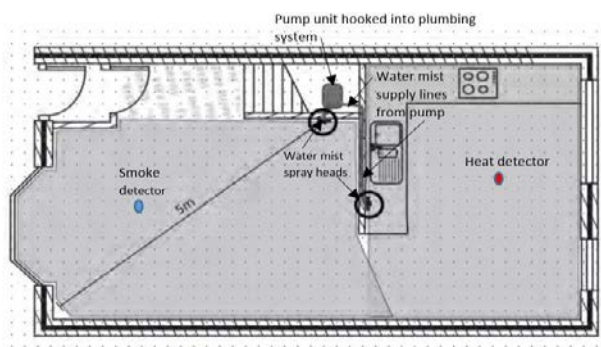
Layout of Watermist system to open plan Lounge/Dining/Kitchen – 2 fixed spray nozzles mounted at between 1400mm – 1500mm above floor level.
